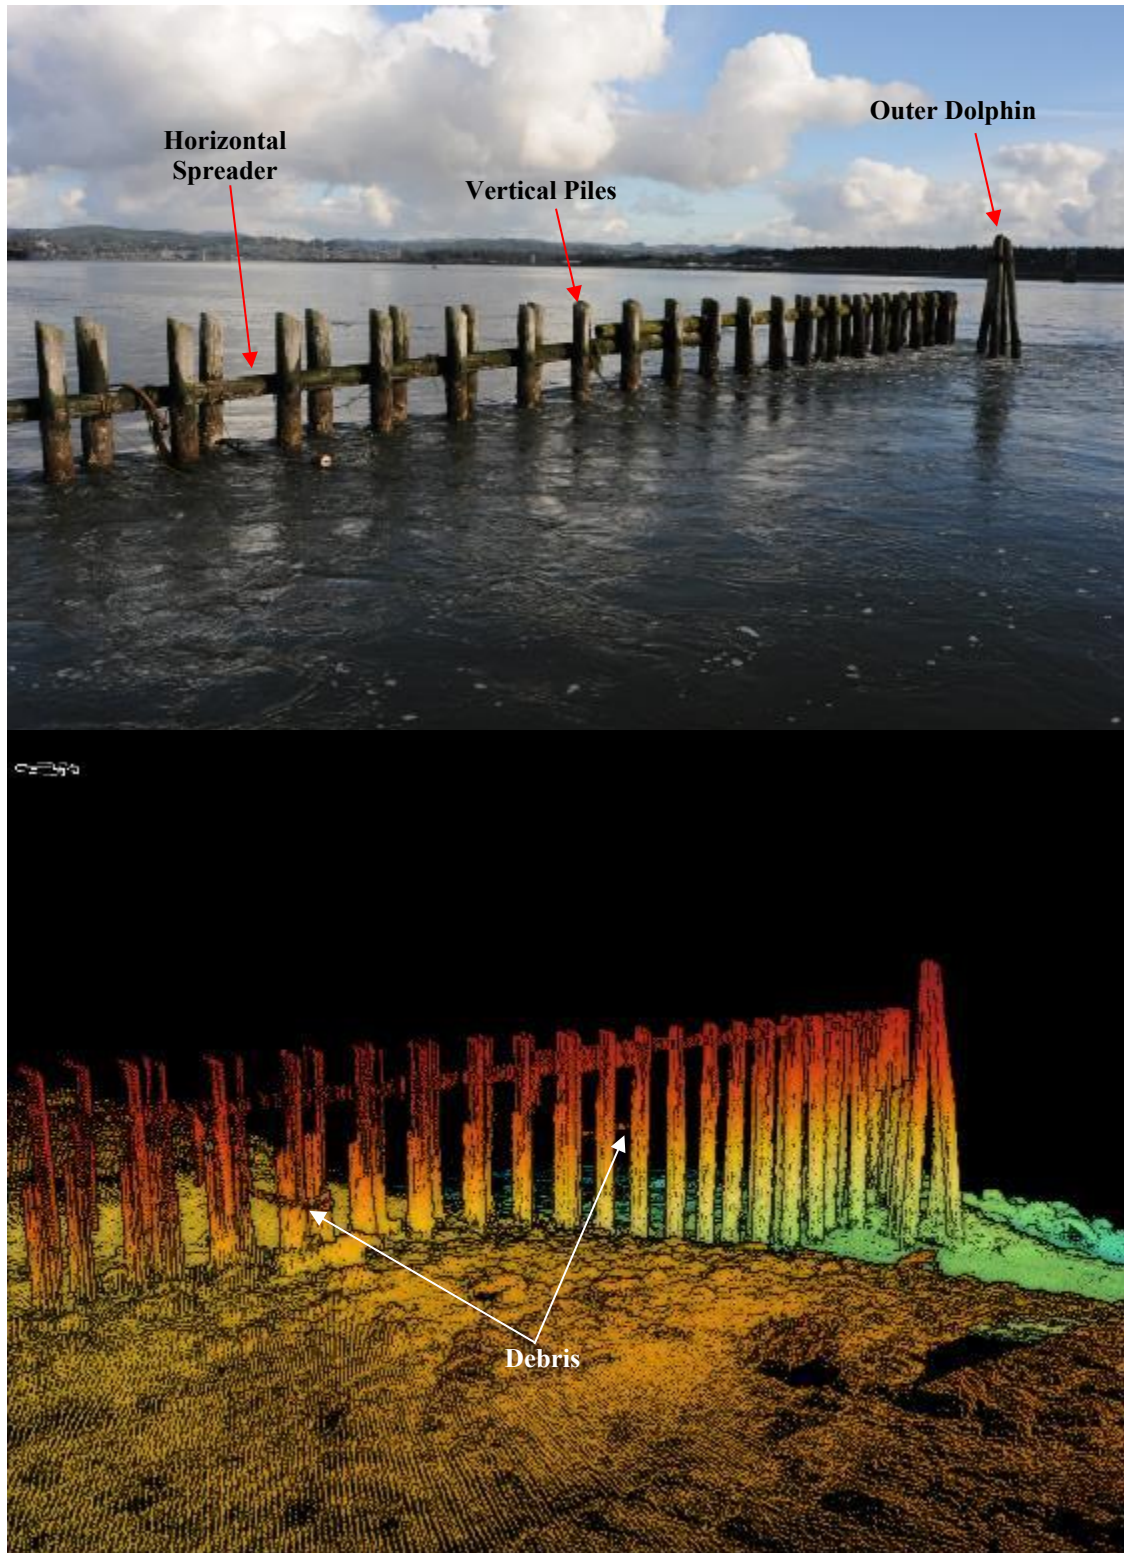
Pile Dike 7.0 viewed from downstream looking riverward.
